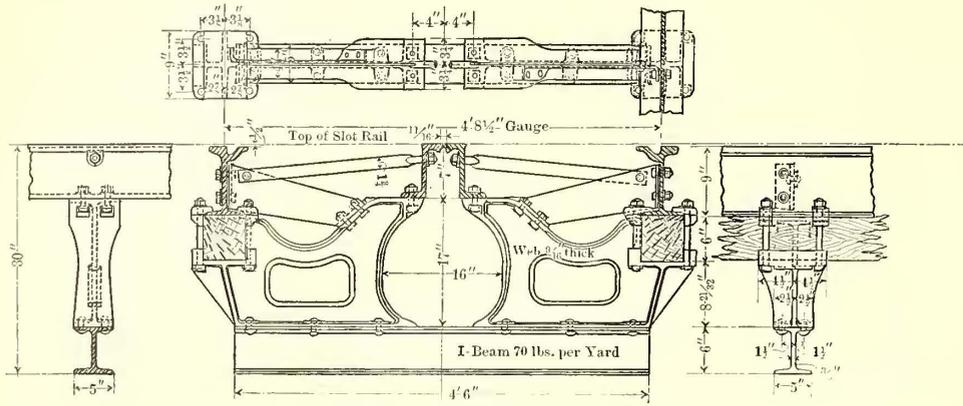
STANDARD YOKE, NEW CONSTRUCTION
